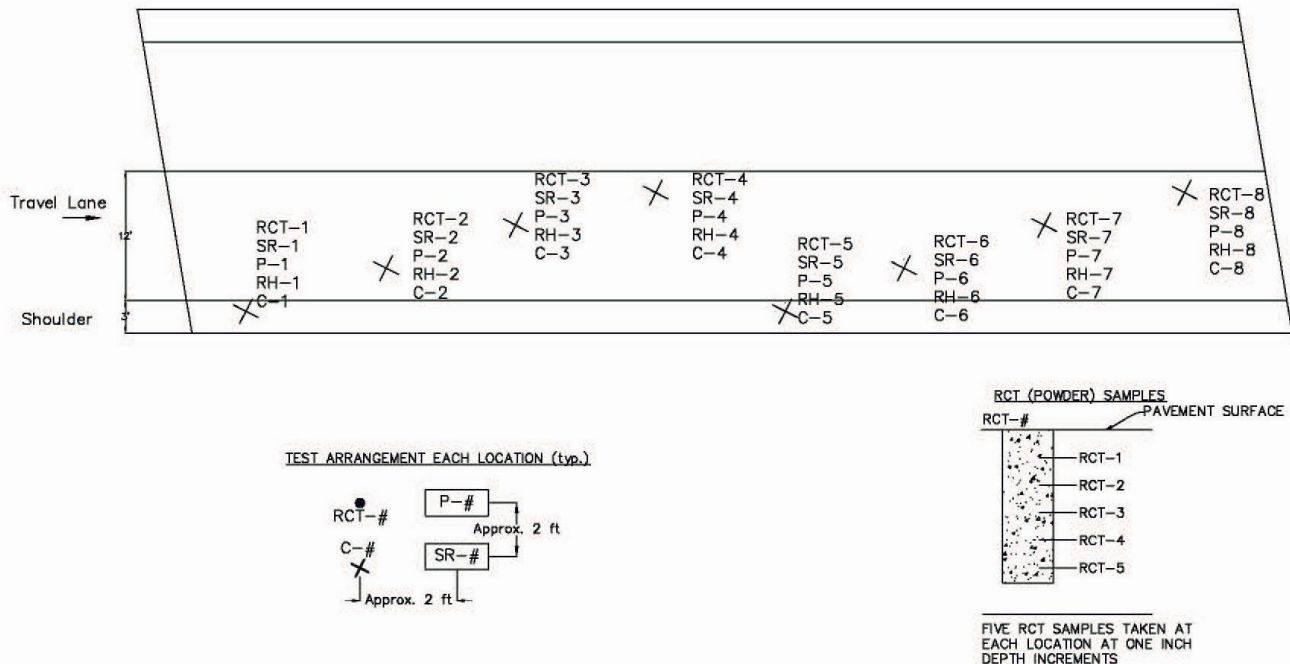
Typical sampling and testing location plan for shorter bridges.
